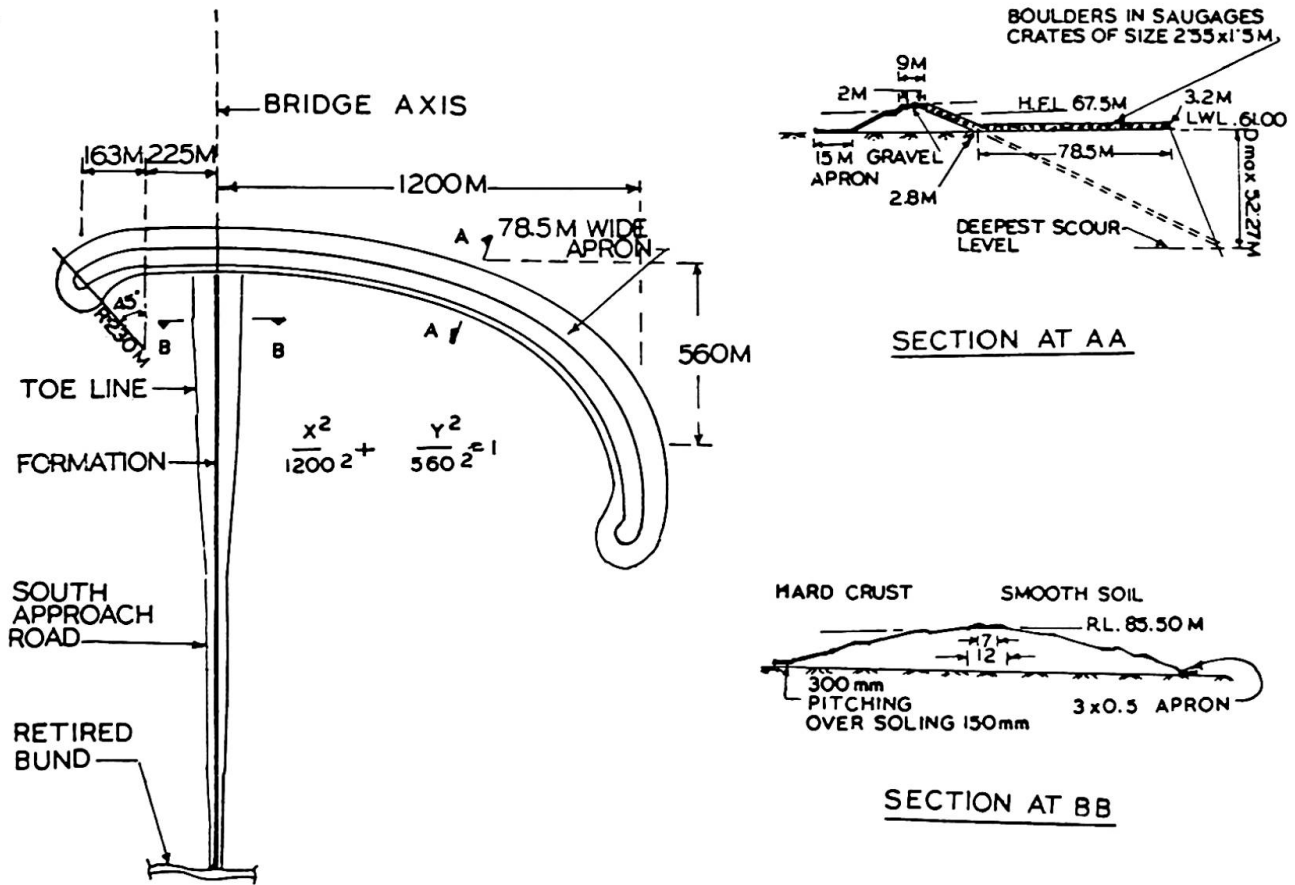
GUIDE BUND DETAILS OF TEZPUR BRIDGE.
